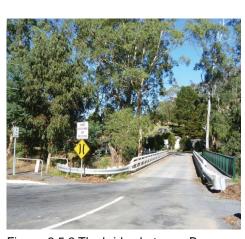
The bridge between Broome Road and Whittlesea - Yea Road
